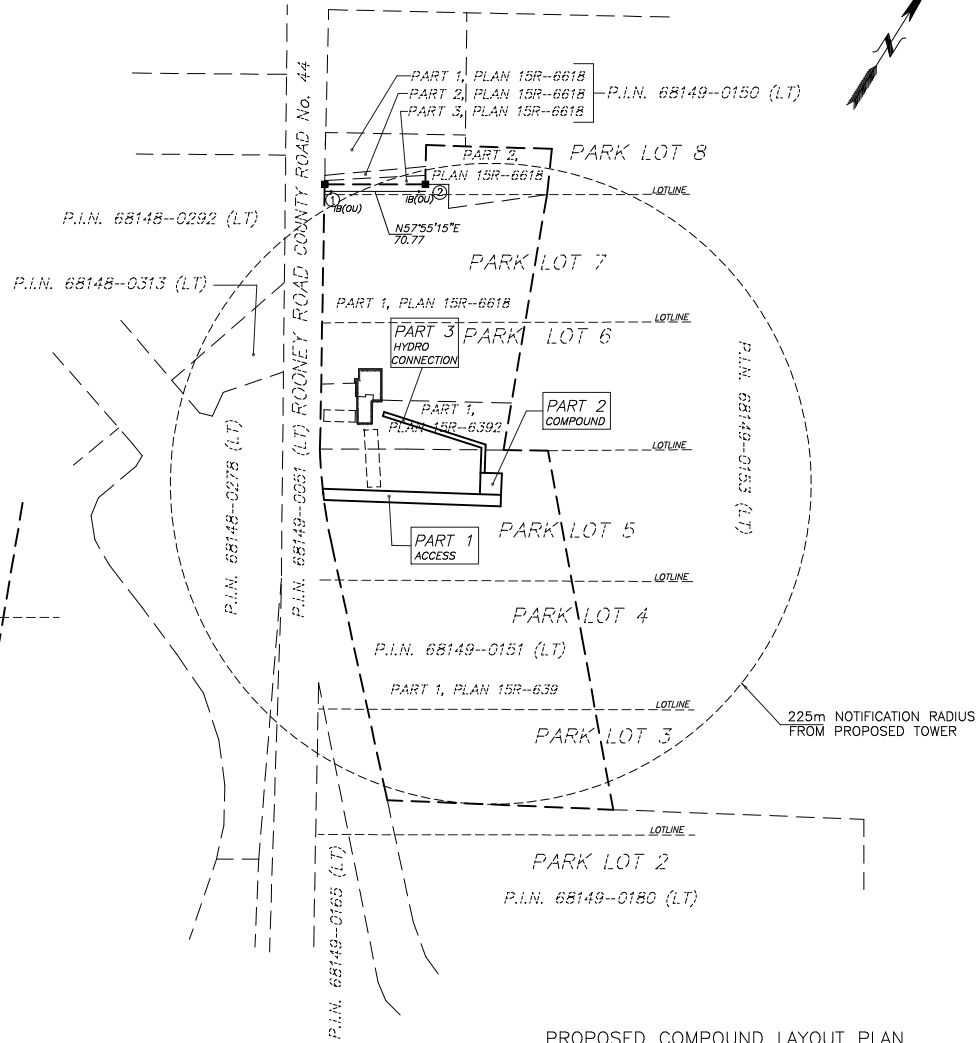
(Appendix "B") Site Plan- Fenced Parking Area
